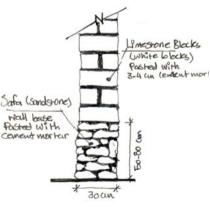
Wall section showing Qişiyyah and the external limestone brick wall
